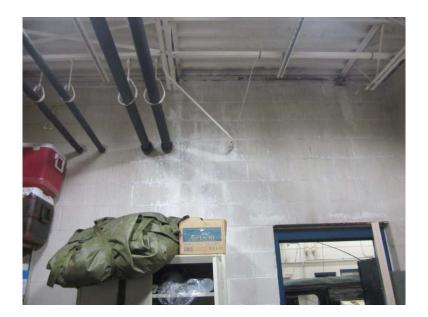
Water Damage and Efflorescence on Cement Block Wall in RSP Storage Room
